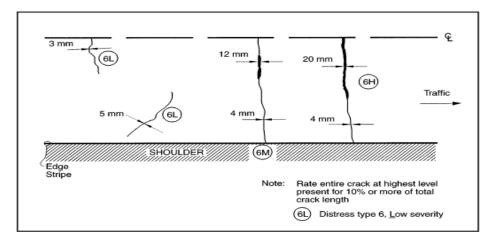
Transverse Cracking Asphalt Concrete Surfaces (John, et al., 2003)
